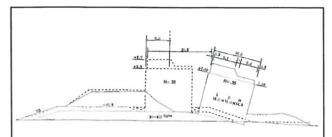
Cross-section of caisson no. 35 before and after the storm in February 1991, First Central Breakwater Hachinohe Port, Japan (Ligteringen 1996).
